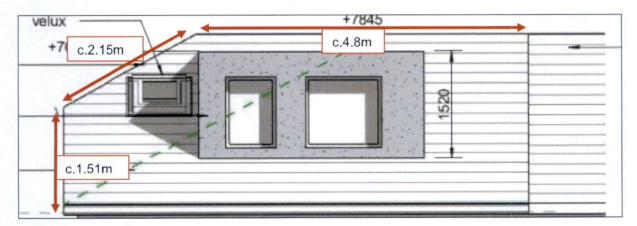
Revised rear elevation showing dimensions approximately and larger hipped roof element.
